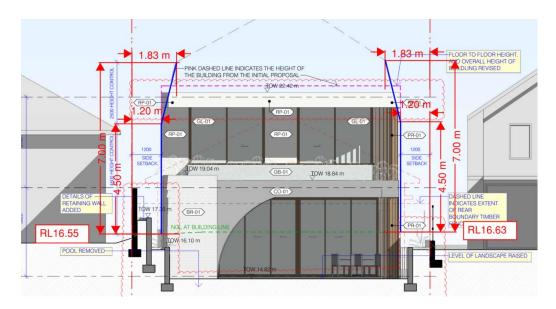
Proposed western elevation with Council markings showing the side setback controls in blue - 8
